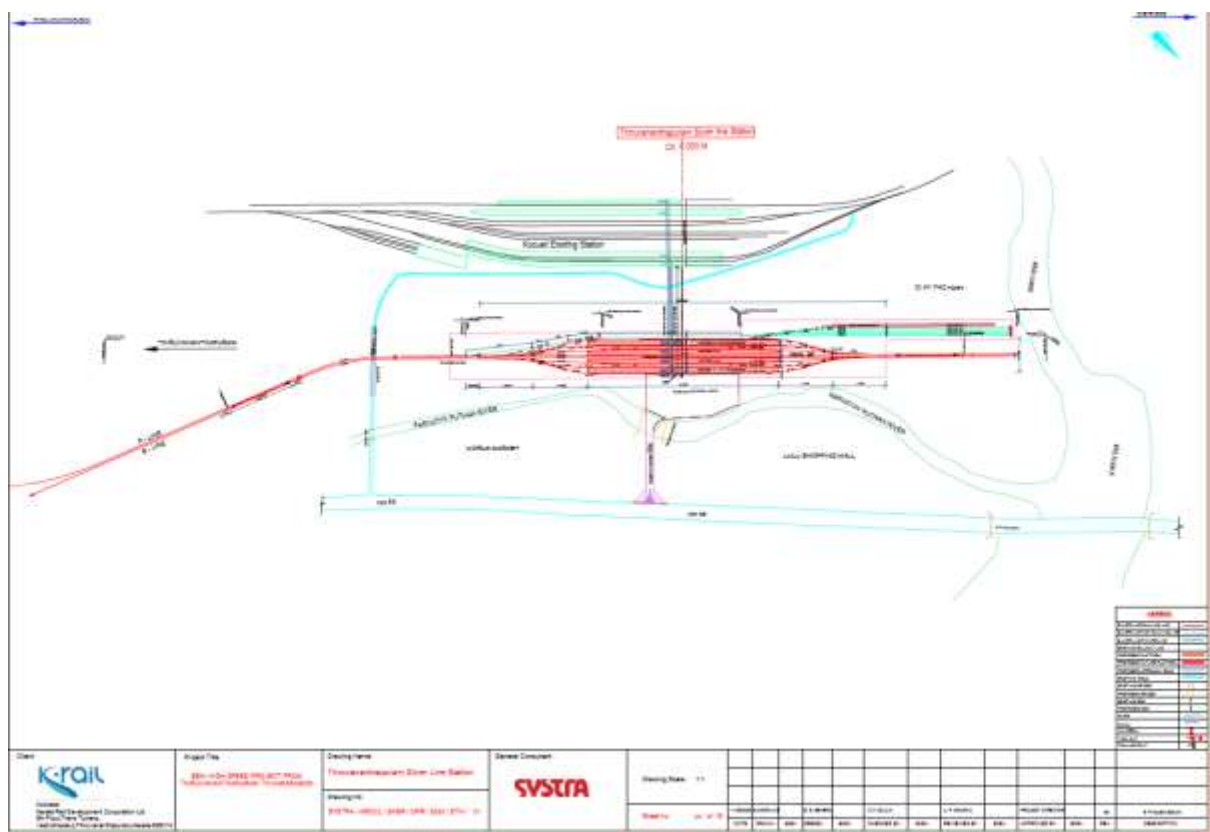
Thiruvananthapuram SilverLine Station Layout Plan
